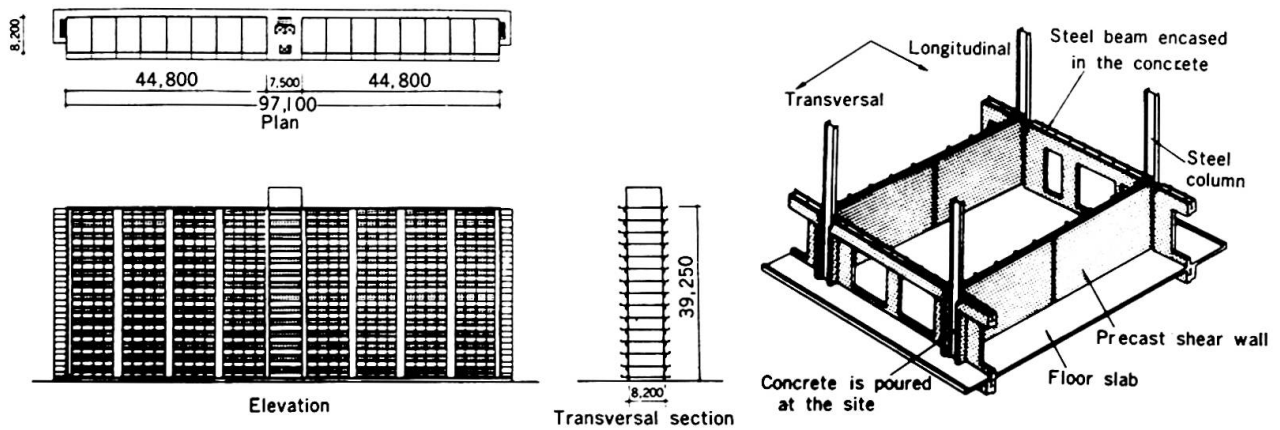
Outline of a 14 story apartment building and its basic structural system
